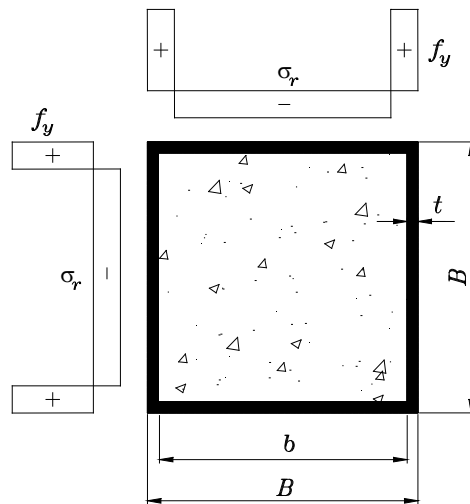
Residual stress pattern in concrete-filled welded steel tubular beam-columns.
